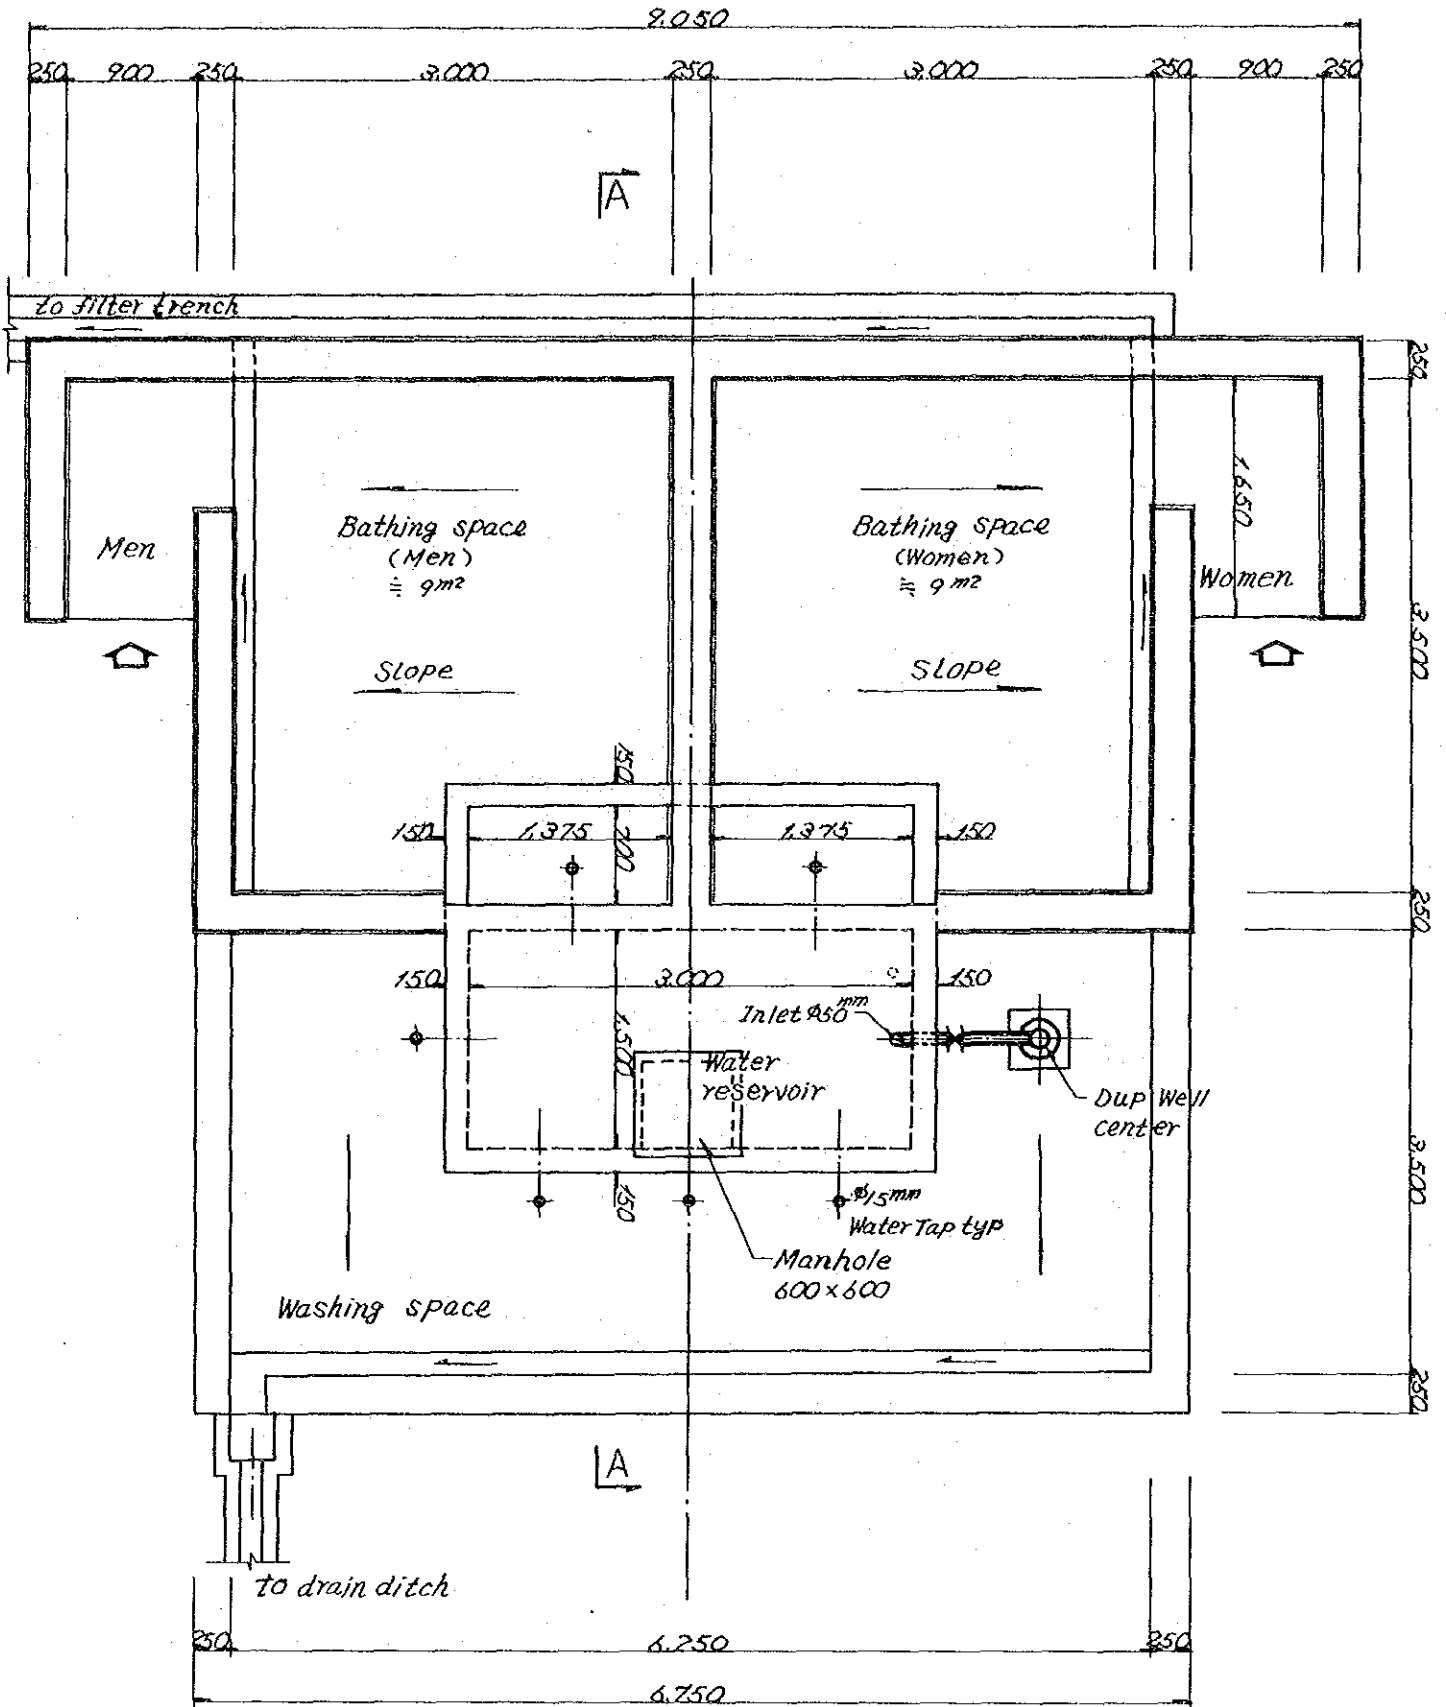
TYPE-D FACILITY-PLAN S=1/50
